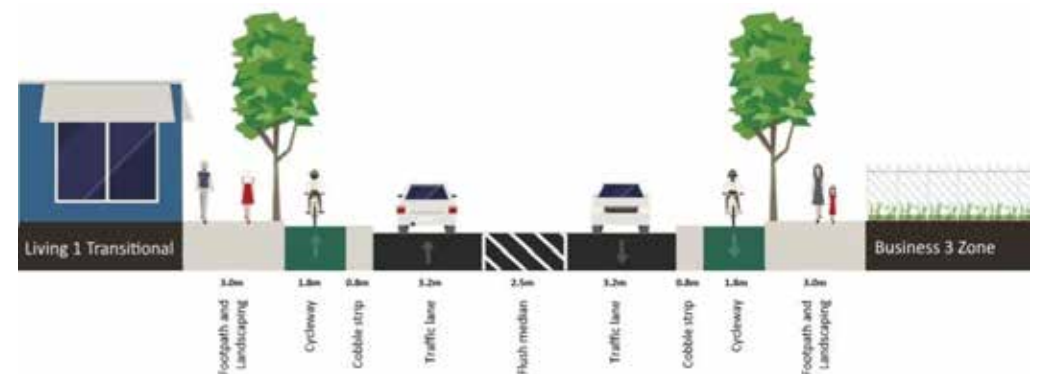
Transitional Living Precinct - Cross section of Gerald Street
